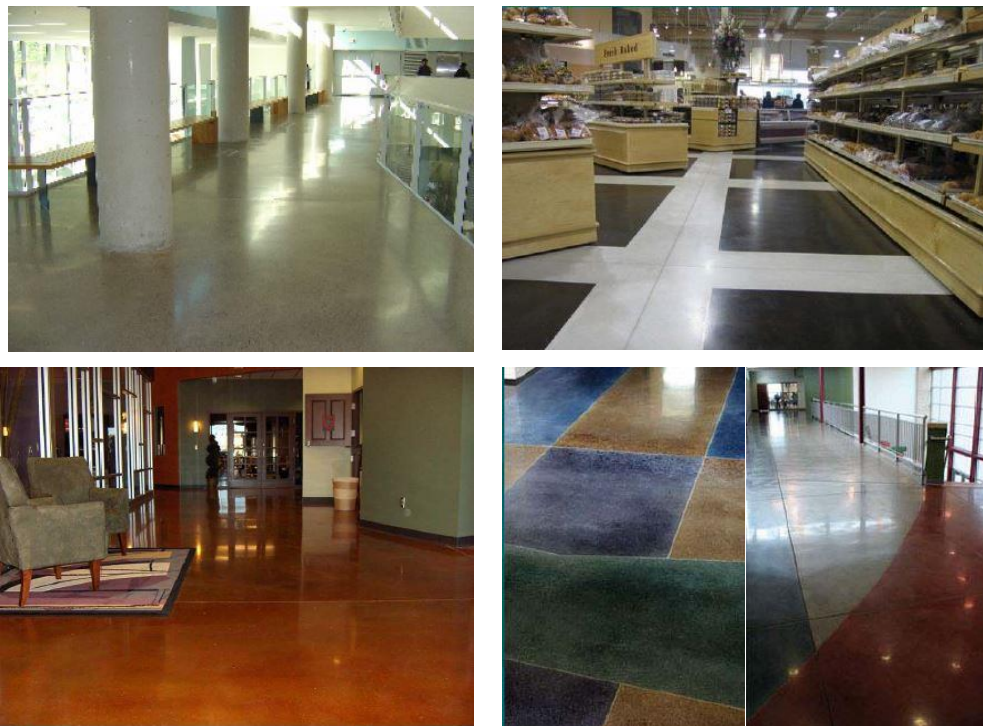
Concrete flooring (Concrete floor contractors association (CFCA), n.d)
